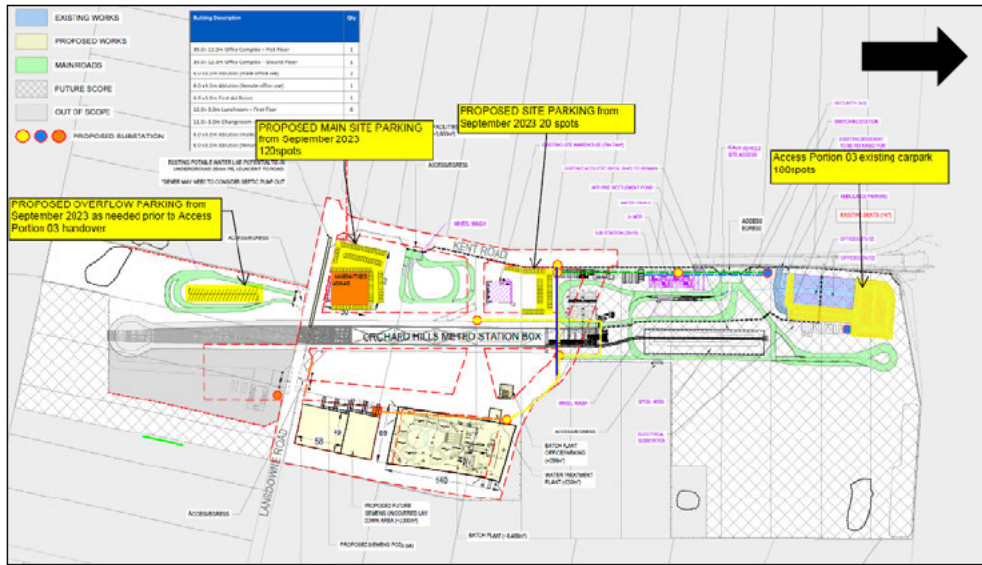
PROPOSED SITE ESTABLISHMENT PLAN
